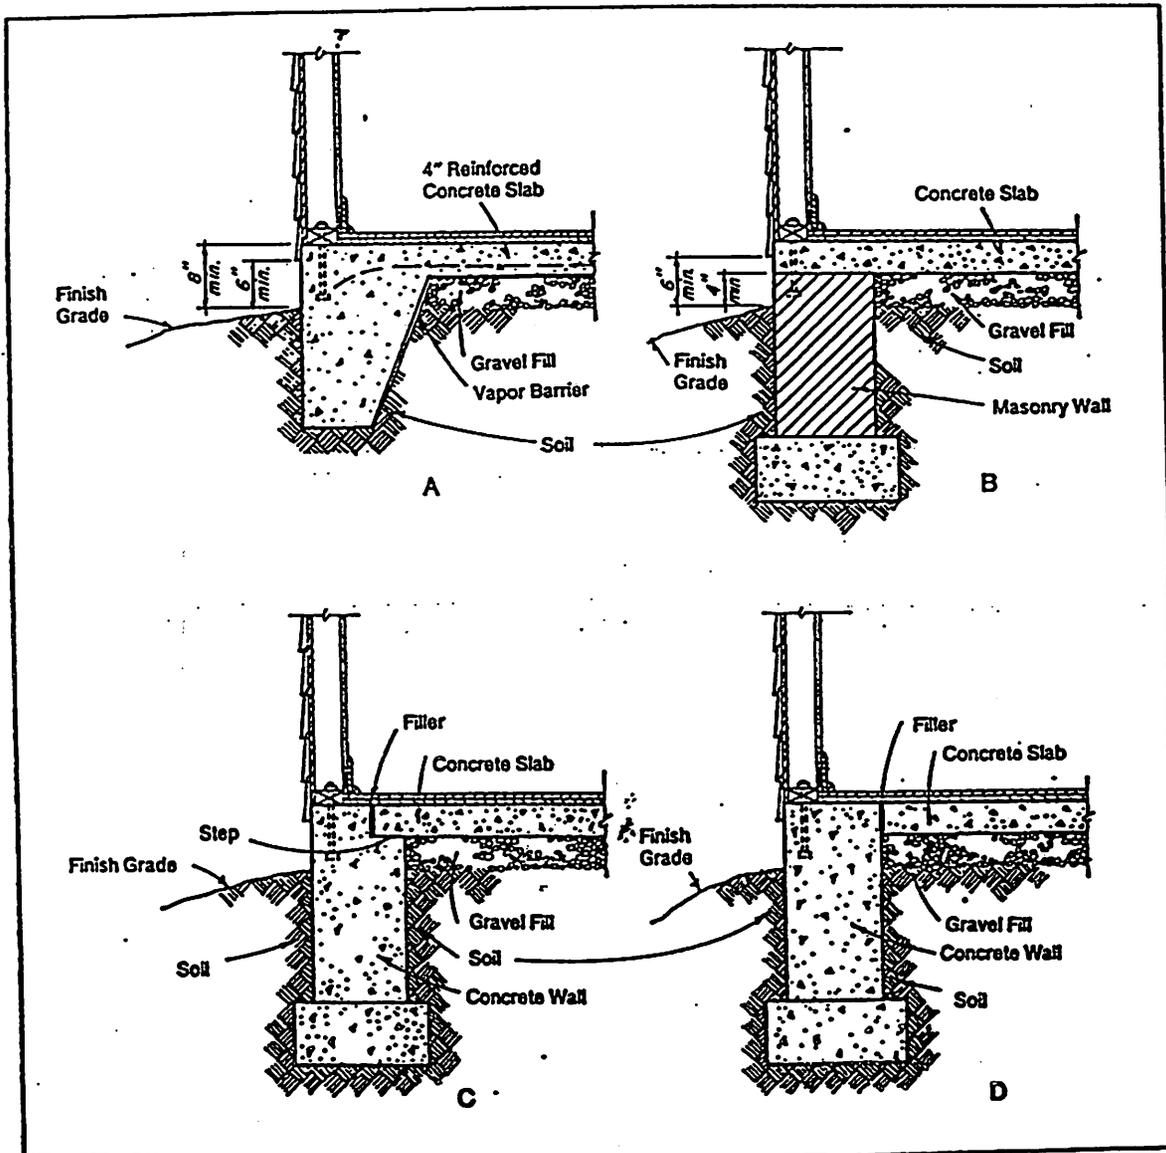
Slab on ground construction. A. Monolithic slab. B. Suspended slab. Floating slab type of construction in which the slab rests on the ledge of the foundation wall. C. Or is independent of it. D. The expansion joints in C. and D. are particularly vulnerable to termite entry. Courtesy USDA.
